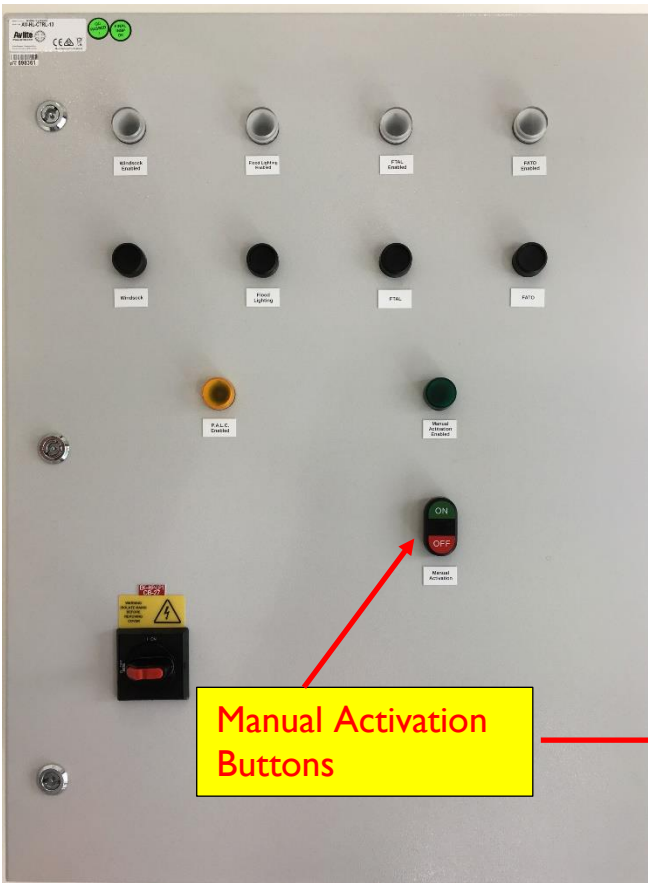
Heliport Lift Lobby Equipment – Southern Wall
